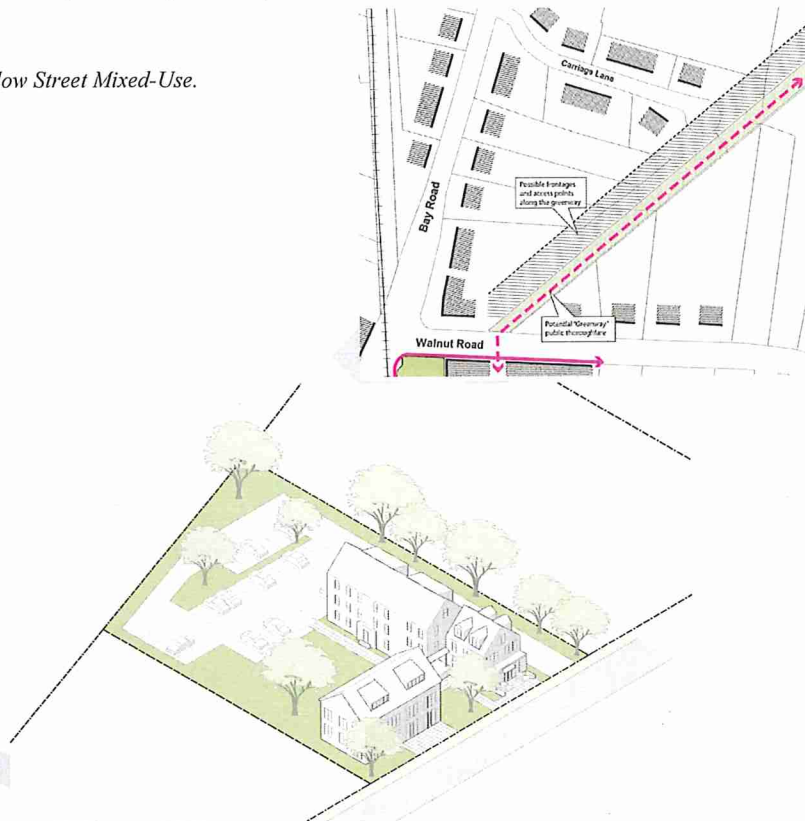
Willow Street Mixed-Use Sub-District Vision Illustration
